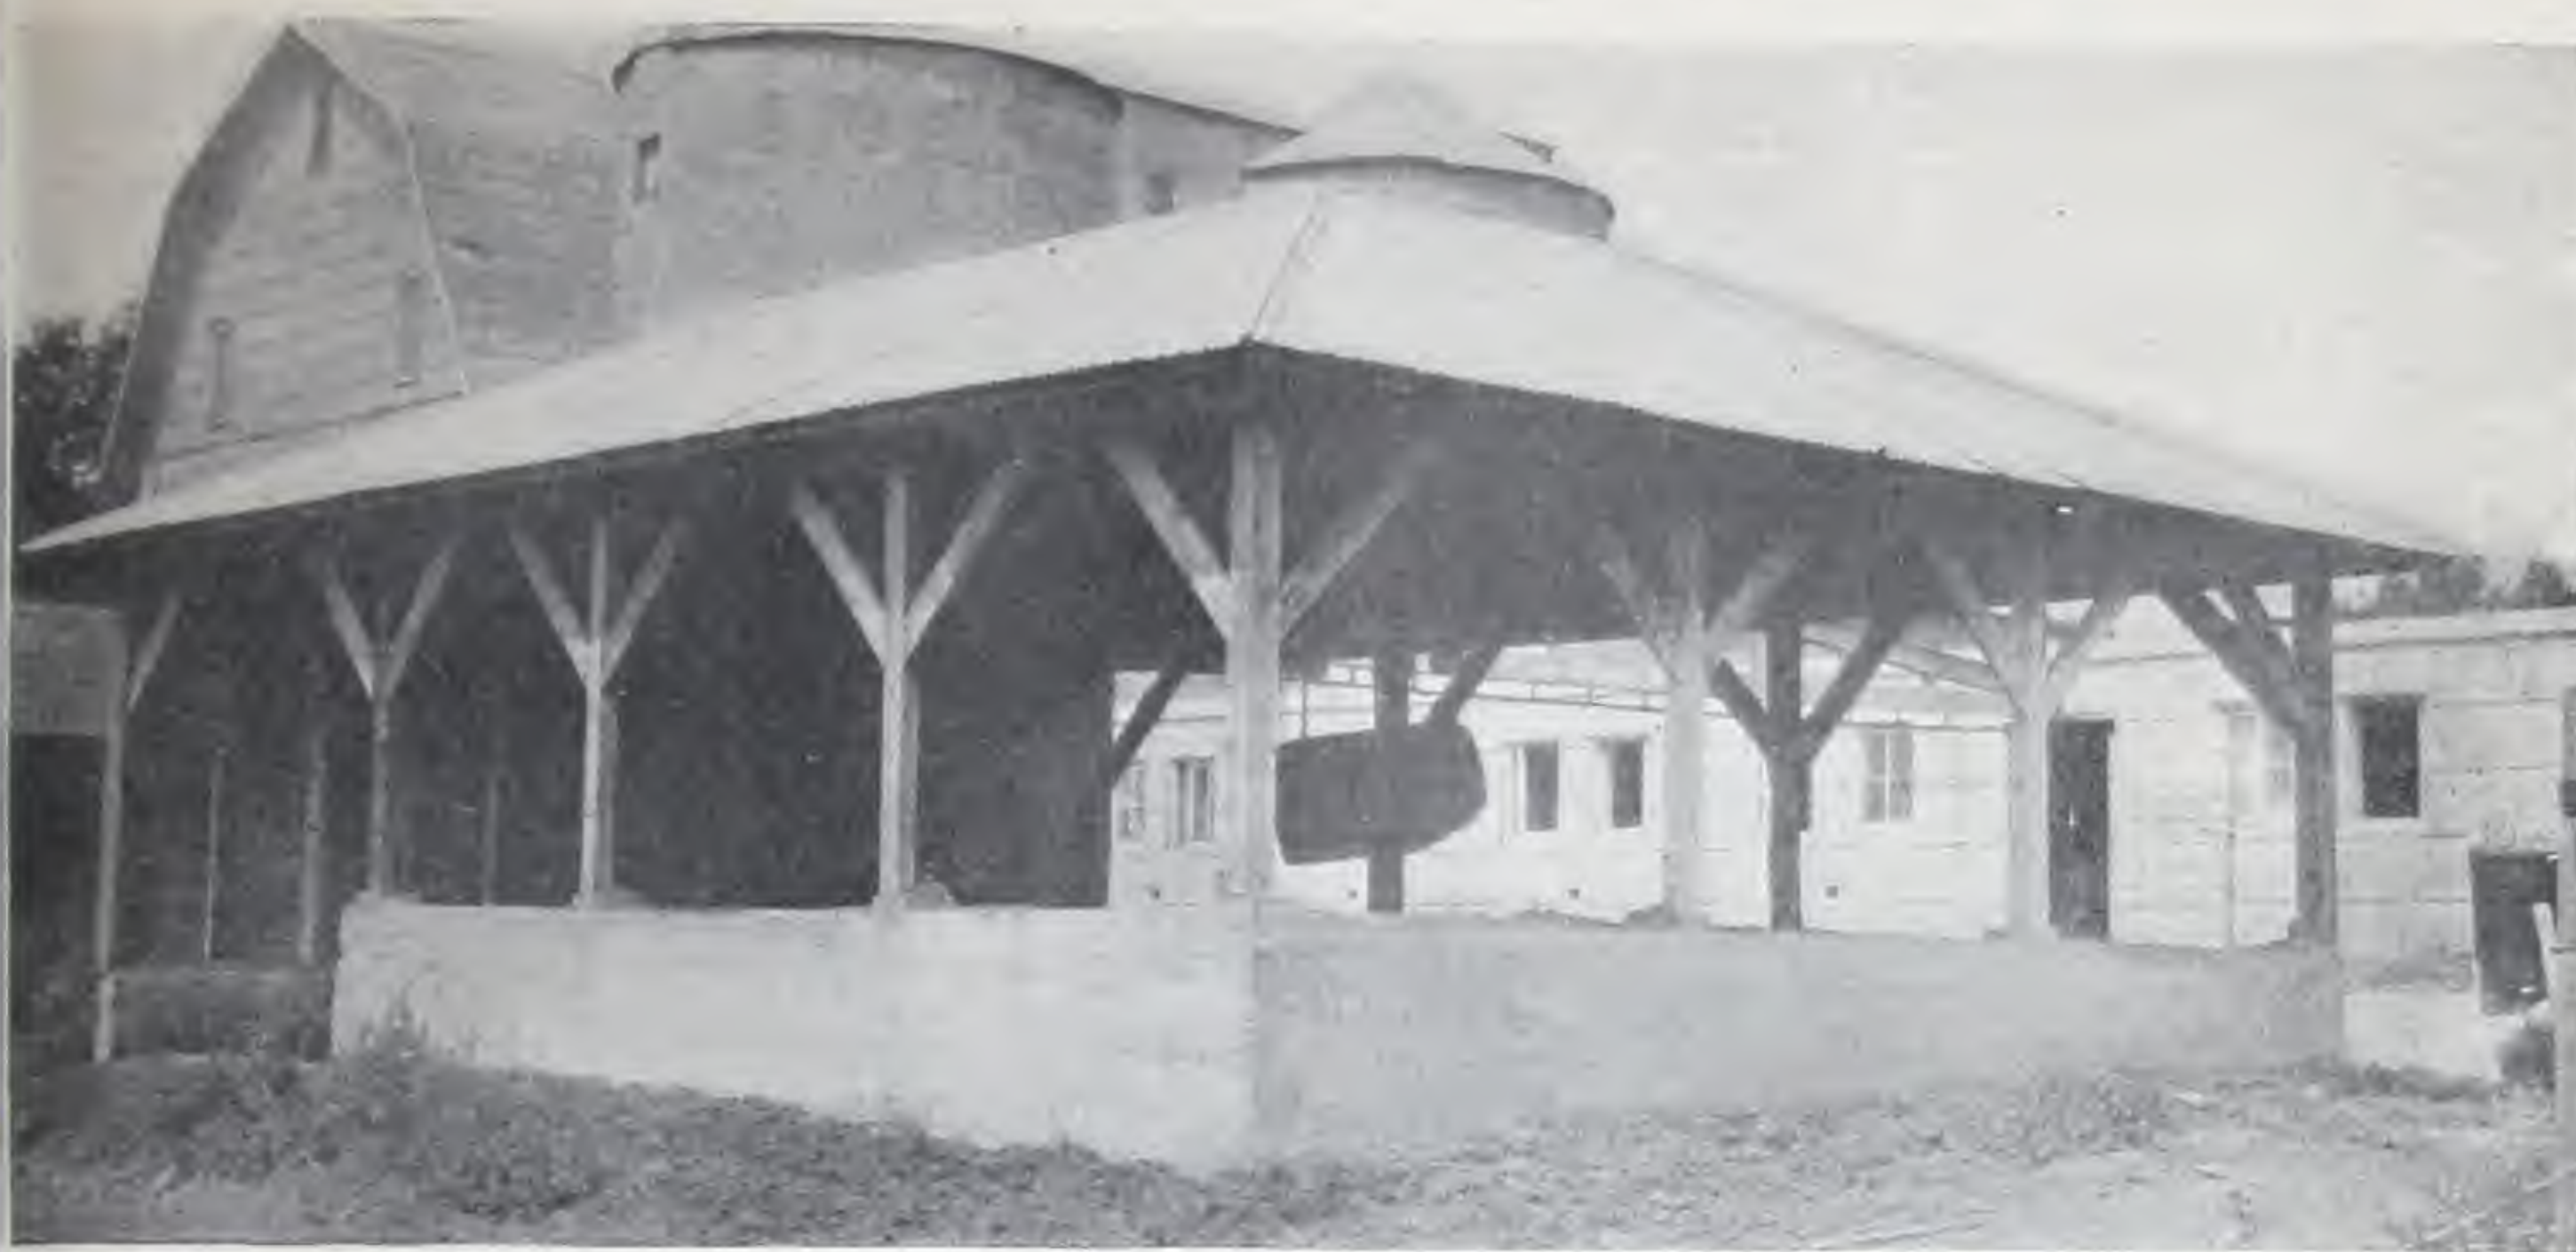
Large concrete manure pit, roofed over, and provided with trolley carrier from barn.
